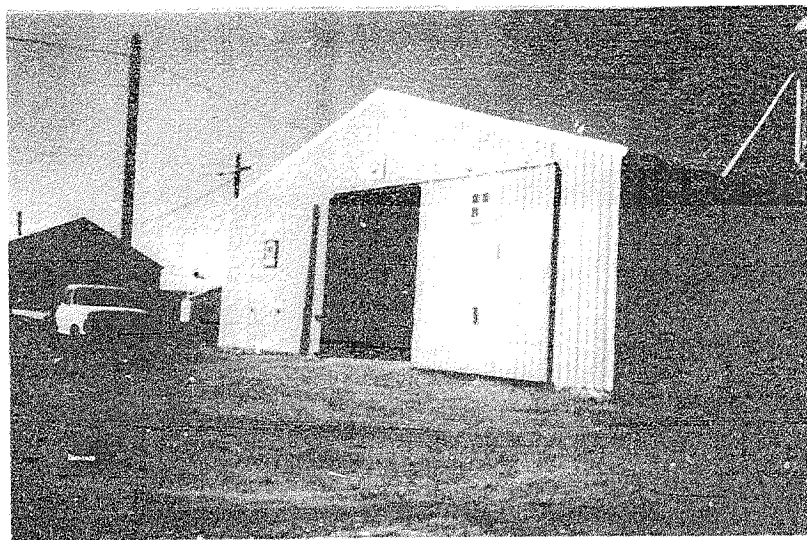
EAST ENTRANCE TO NEW WAREHOUSE.
